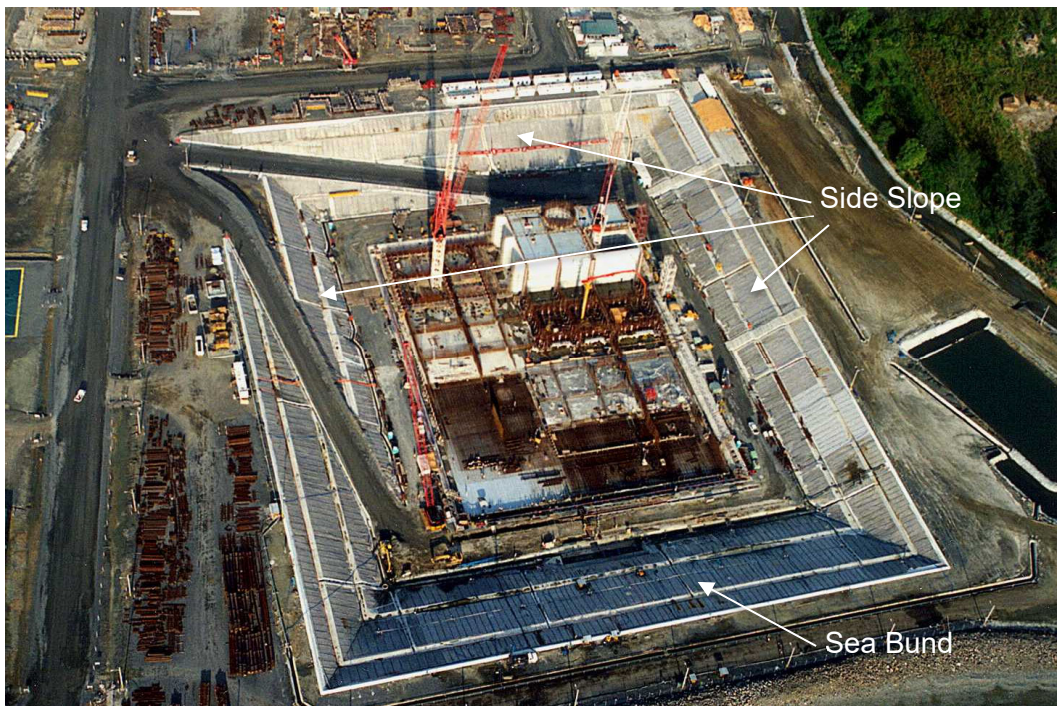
Aerial photograph showing dry dock and CGS construction (© Arup)
